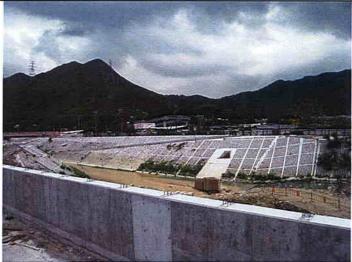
h November 2007, viewed towards Ma Wat River near Kiu Tau illustrating Artificial Drainage Channel (downstream of Kau Lung Hang EIS).
